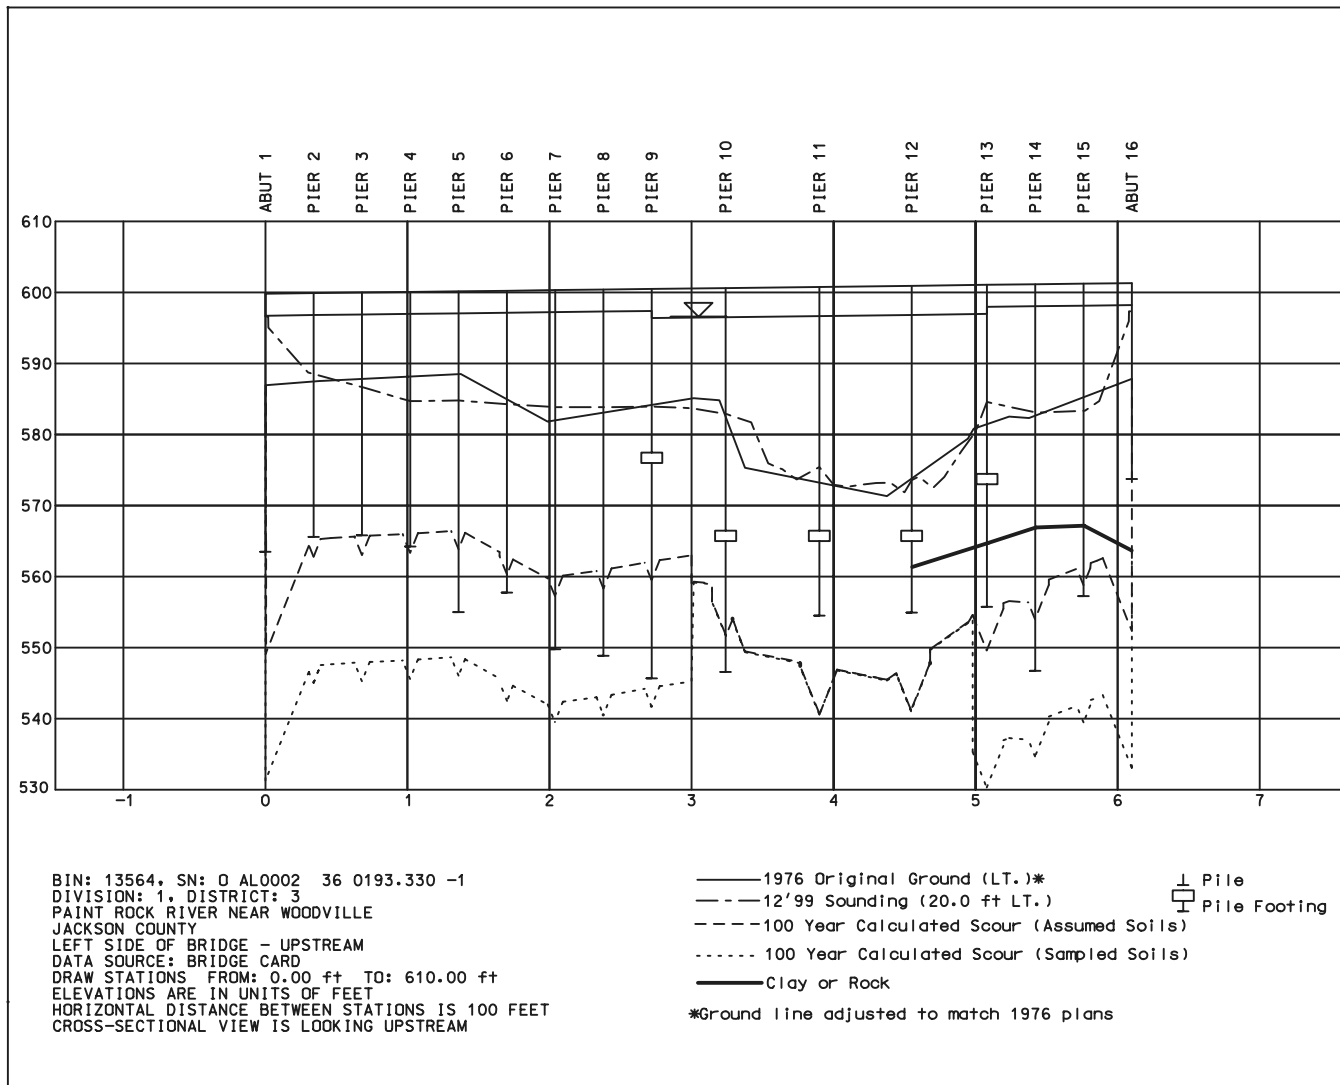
Sounding profiles and scour evaluations for the main channel bridge at the Paint Rock River site near Woodville
